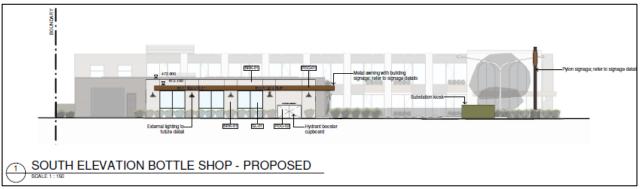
Elevation Plan – Bottleshop with new two storey hotel to the rear of the site (Inglis Street Elevation)
